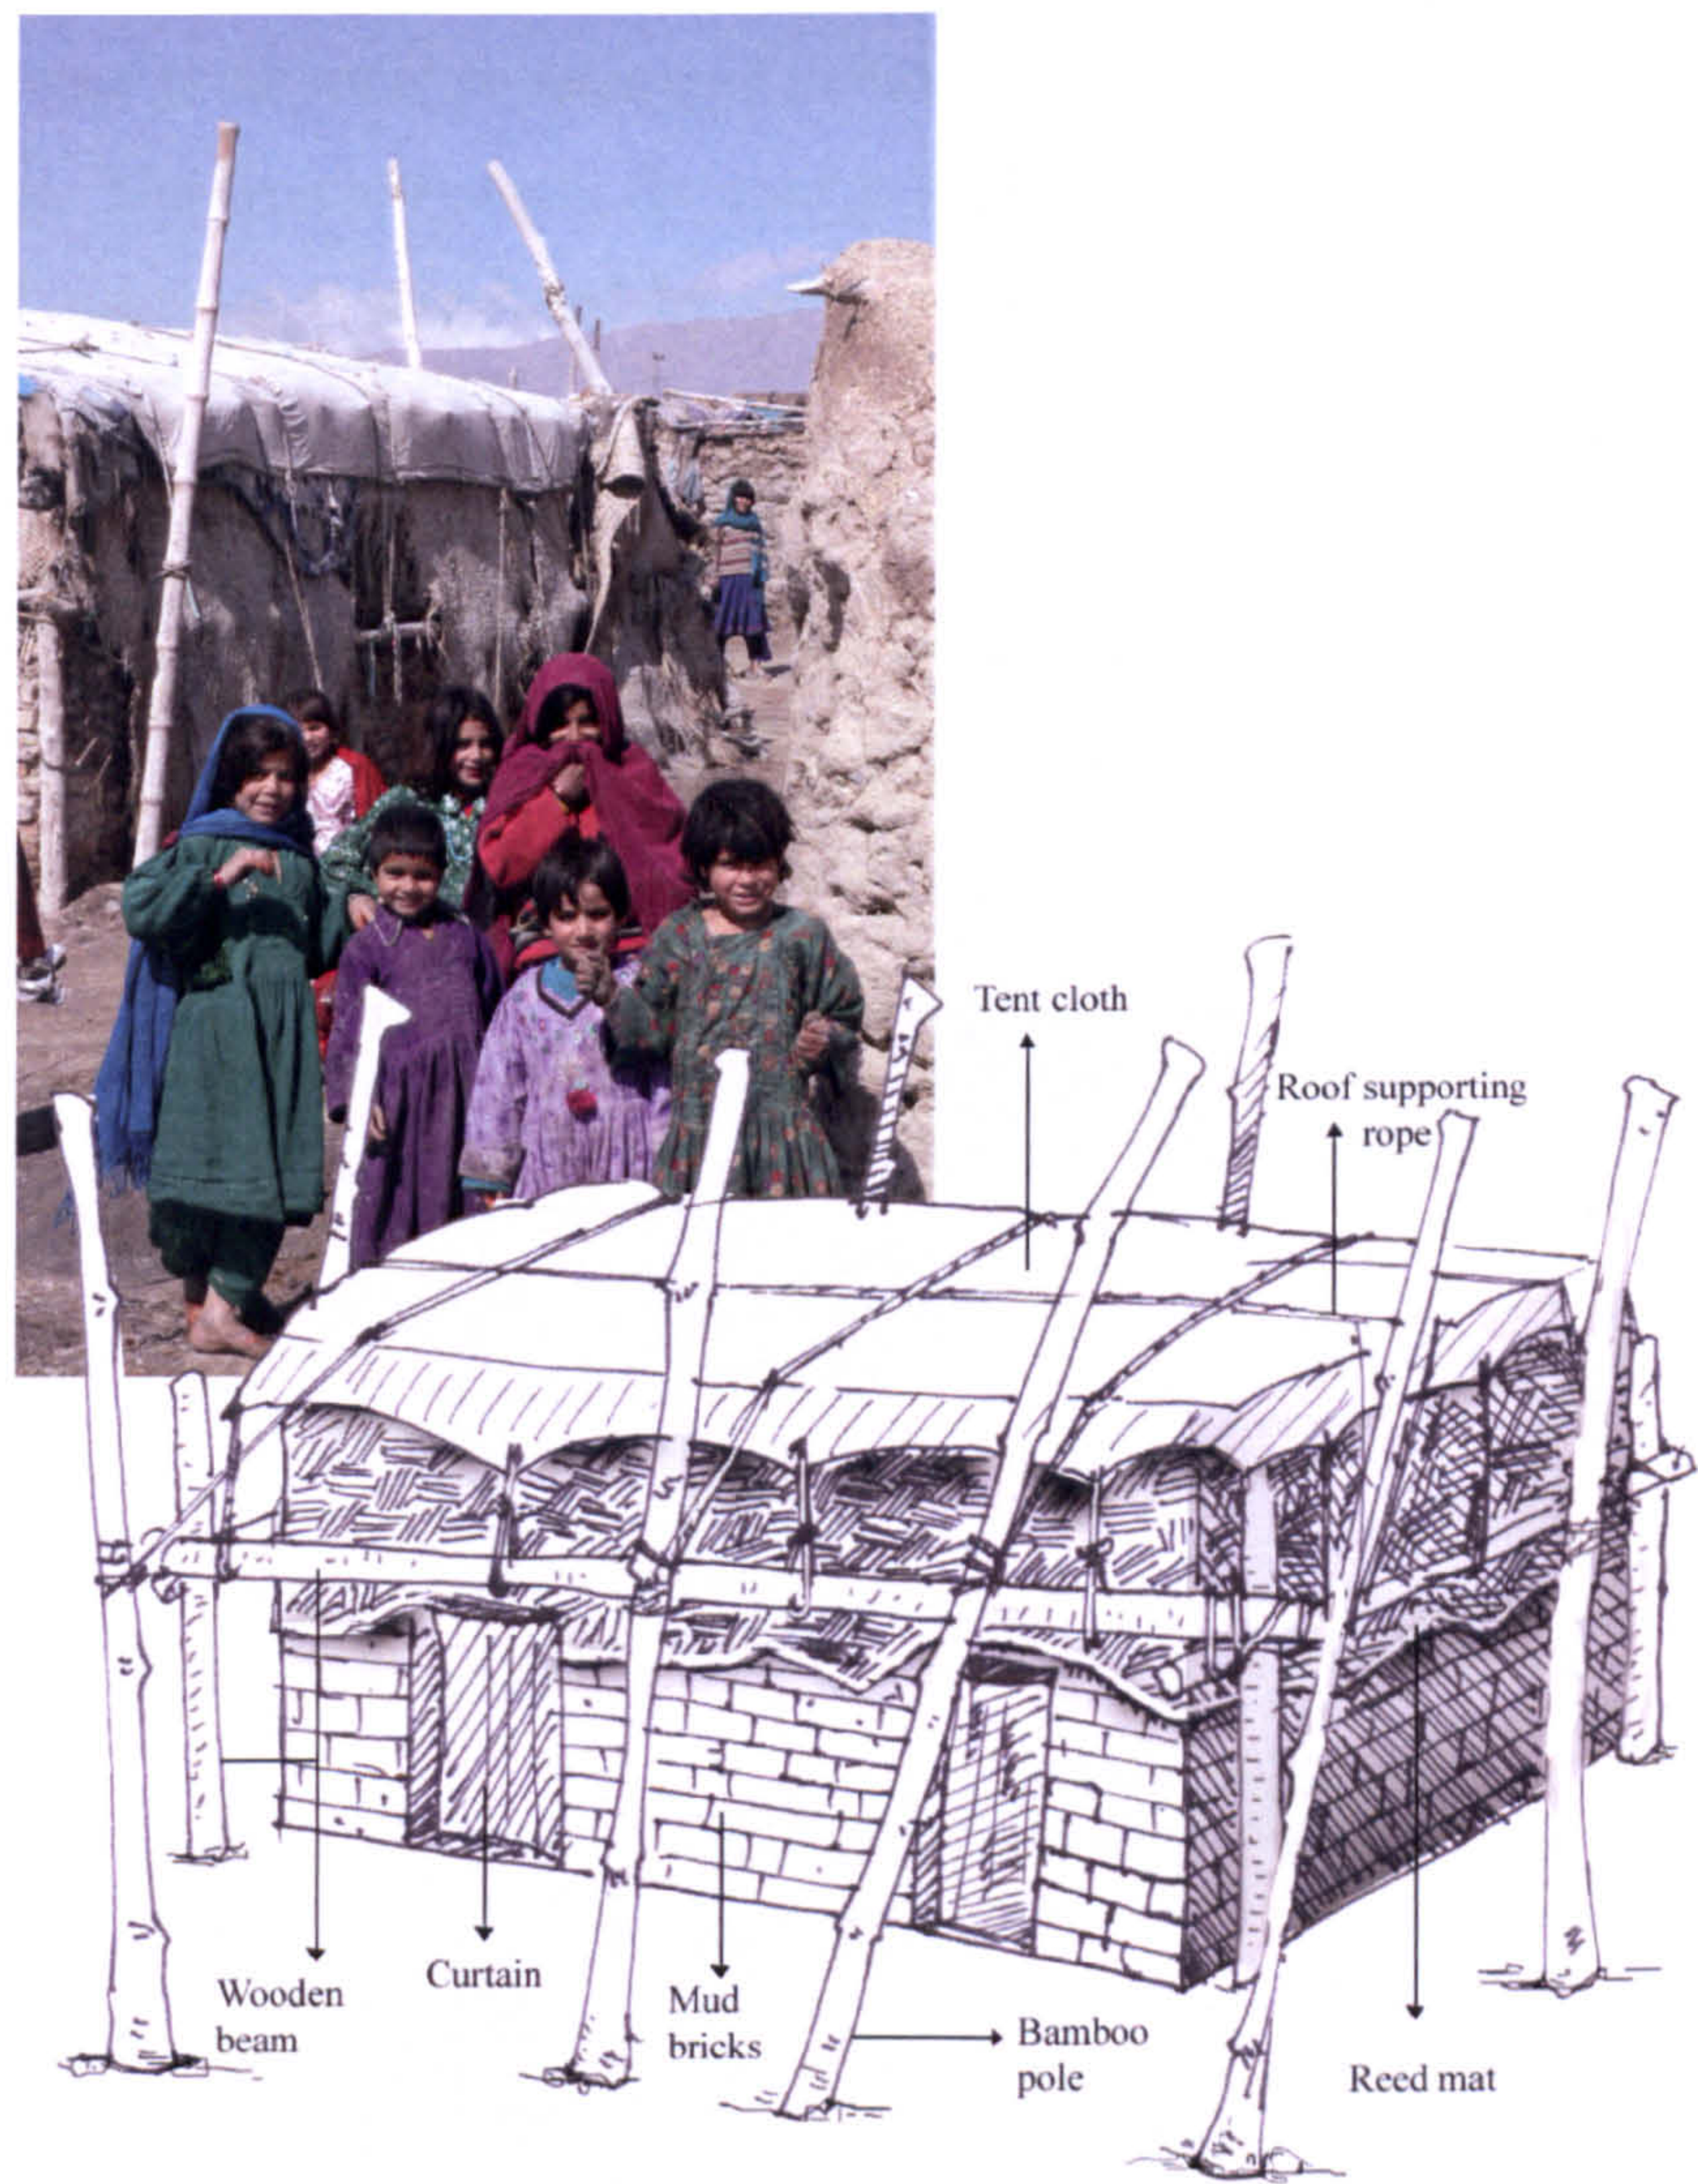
Drawing showing the structure of a typical two-room house with temporary roof. This house is built by using local building materials such as wooden beams, reed mats, bamboo poles, plastic sheets, tent cloth and ropes. Source: Author
